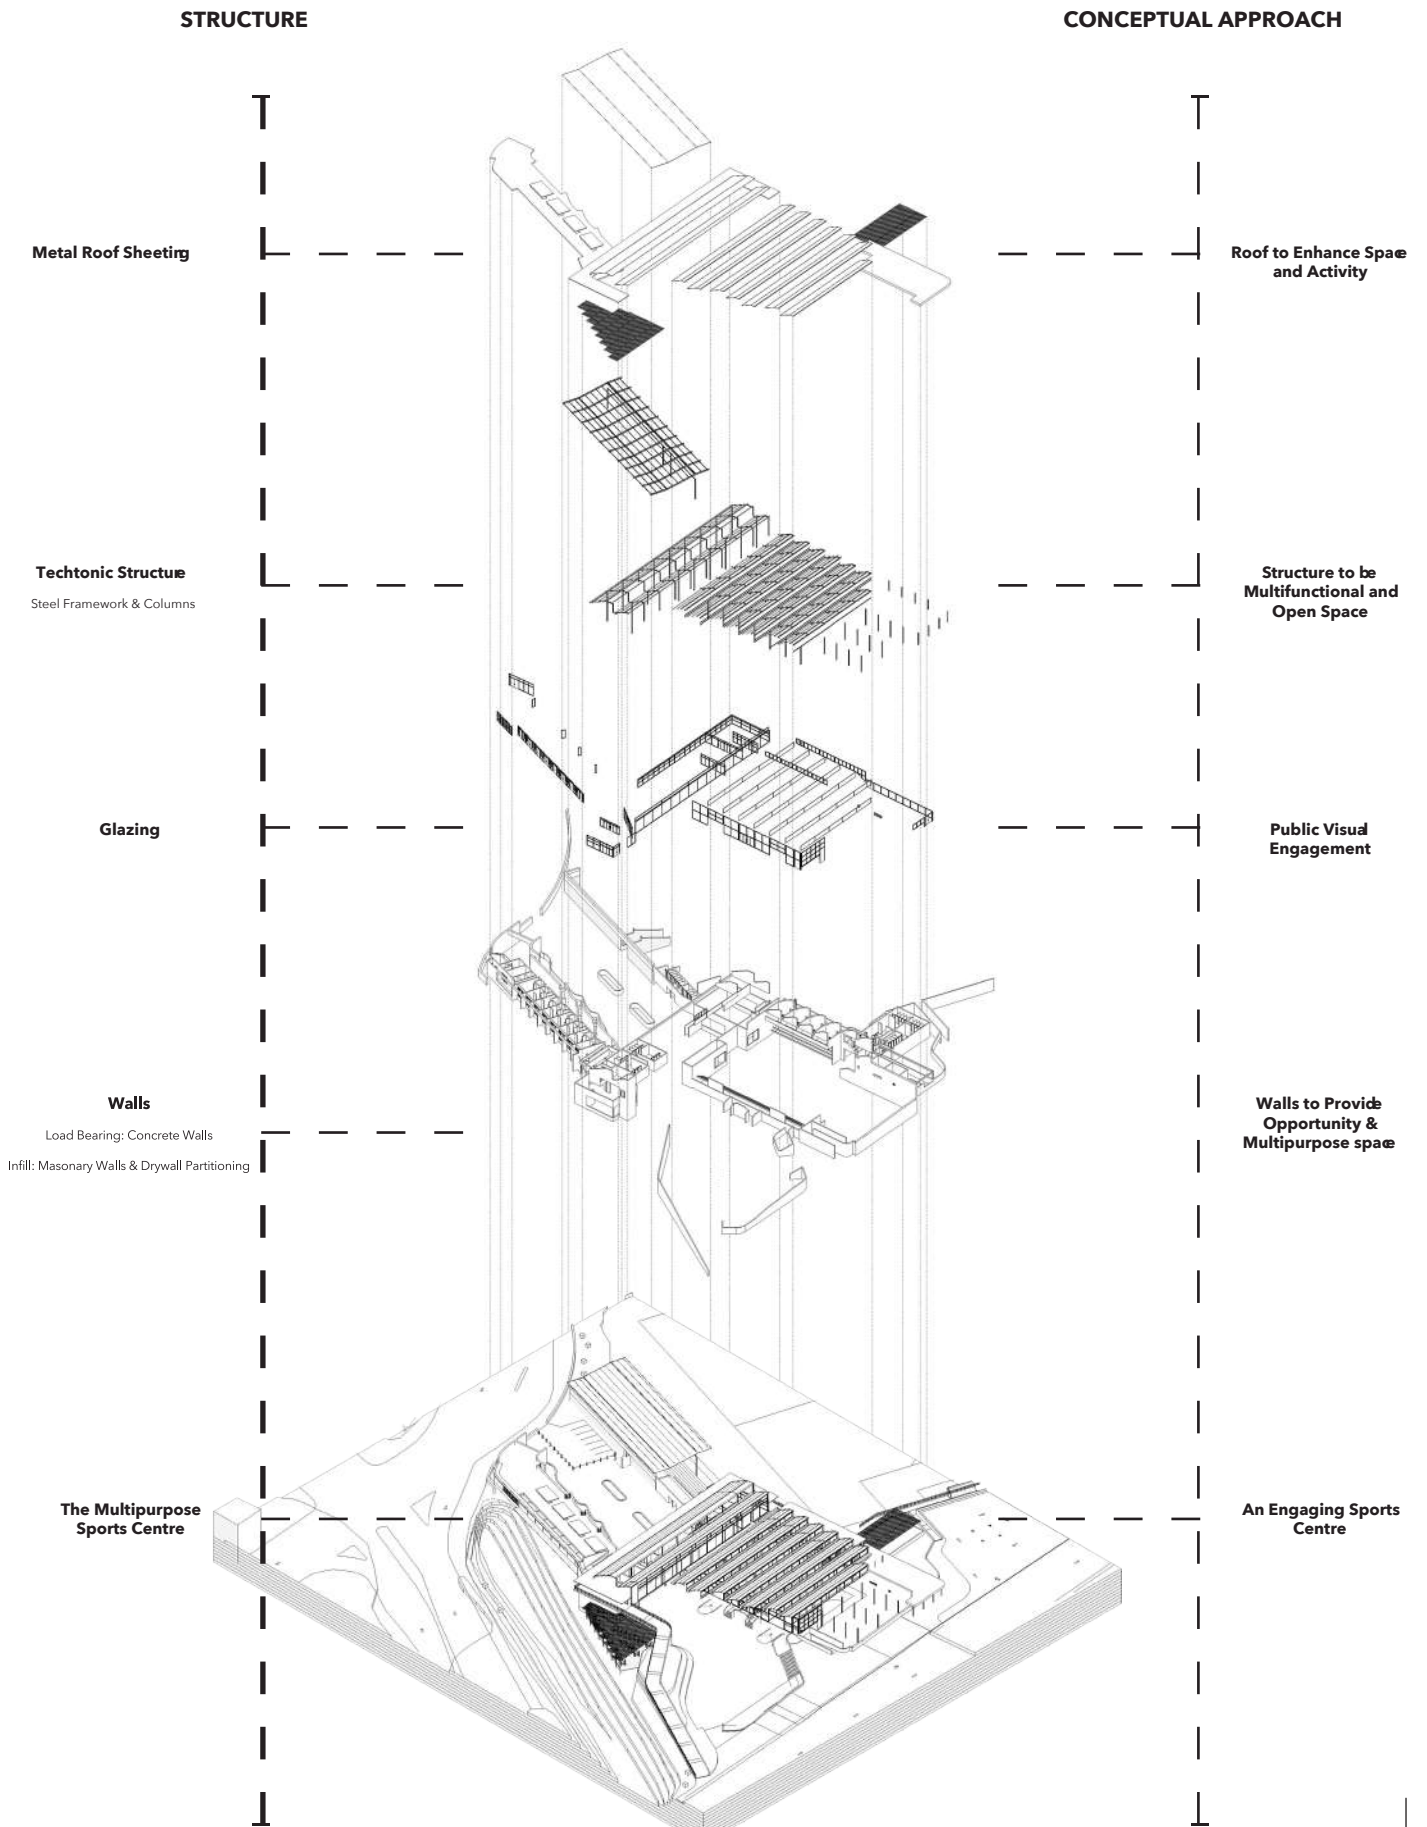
Structural Axonometric and Conceptual Intention (Author: 2019)
